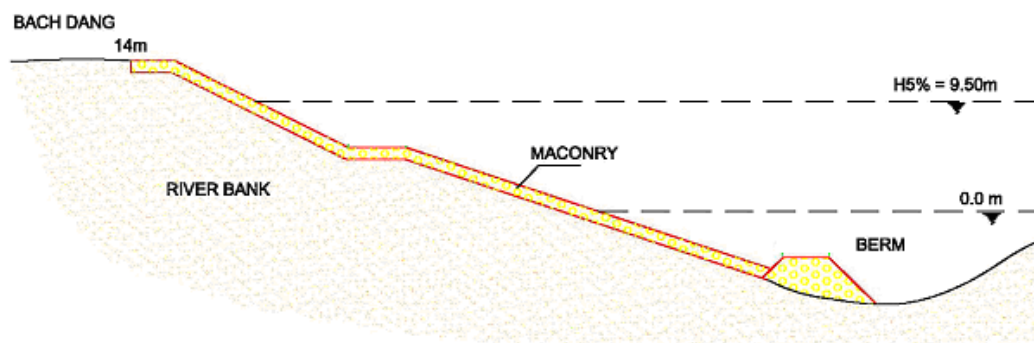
(4) Conceptual Cross-sectional View of the River Bank Revetment
